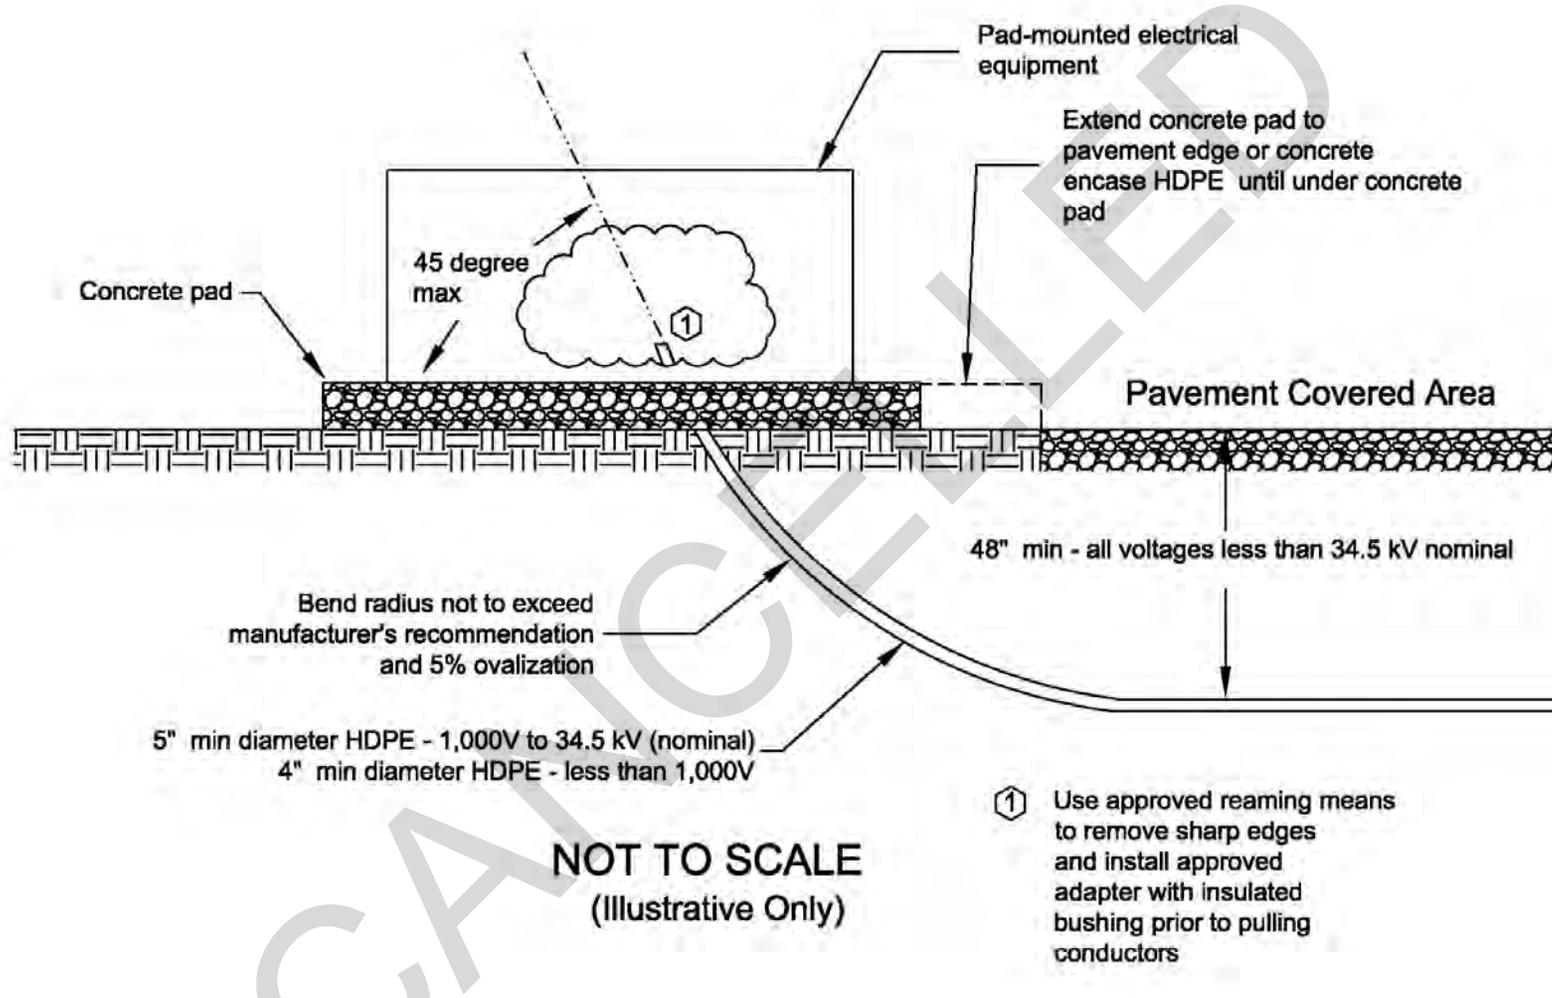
Pavement Covered Area to Electrical Equipment Transition – HDPE Conduit (20°–45°)
